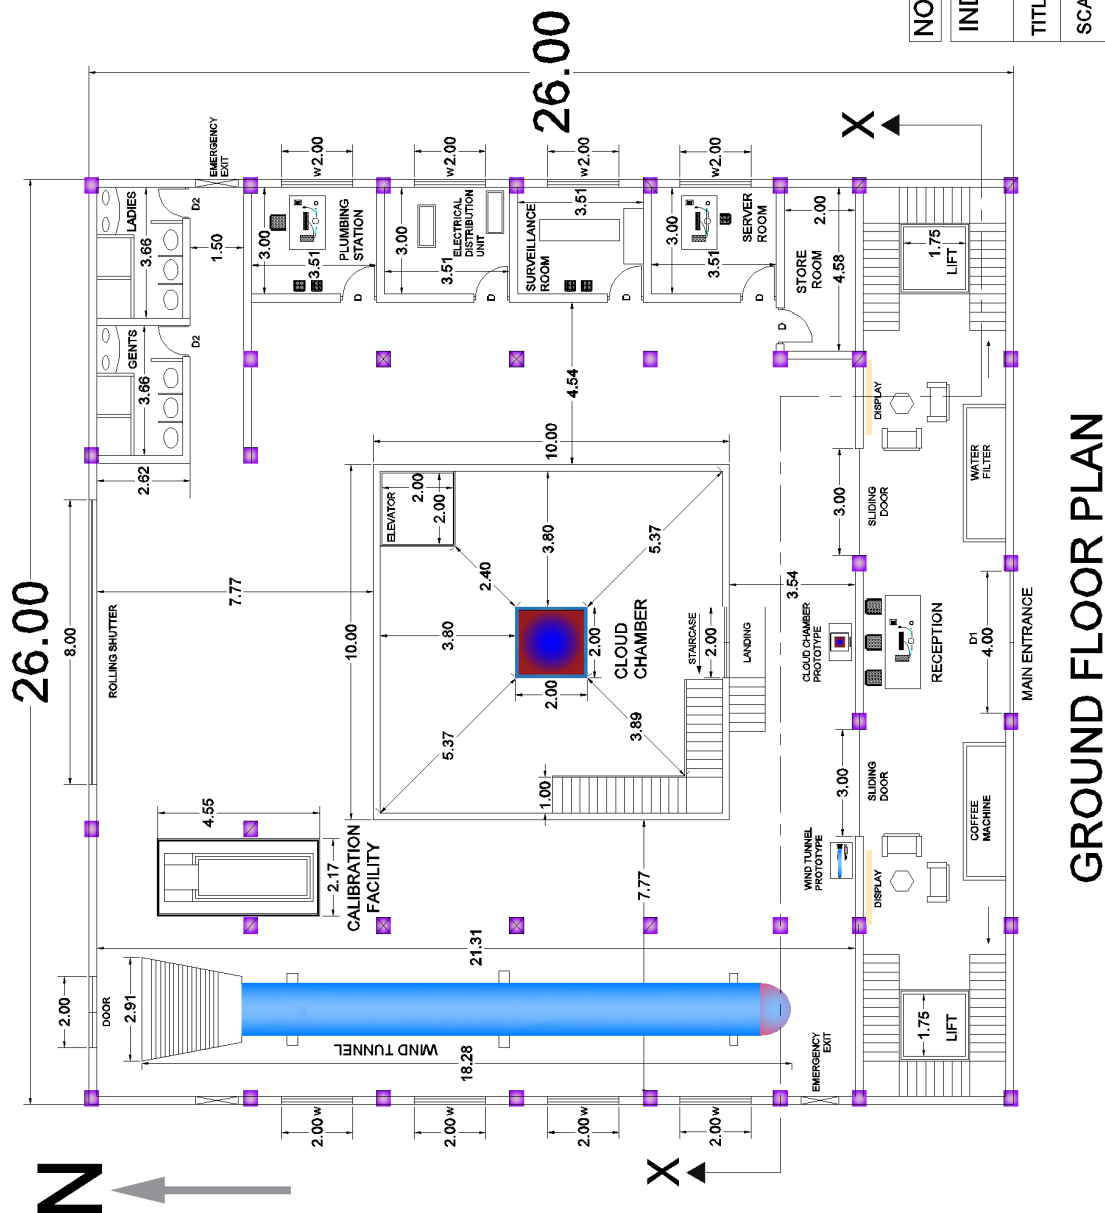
Ground Floor - Plan of the Infrastructure for housing the Cloud Chamber Research Facility
